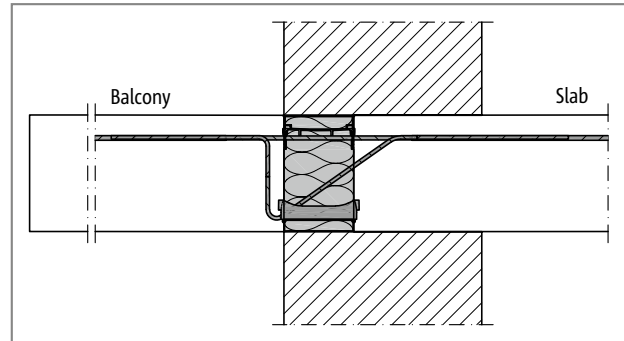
Schöck Isokorb® XT type K: Connection with single-leaf masonry
